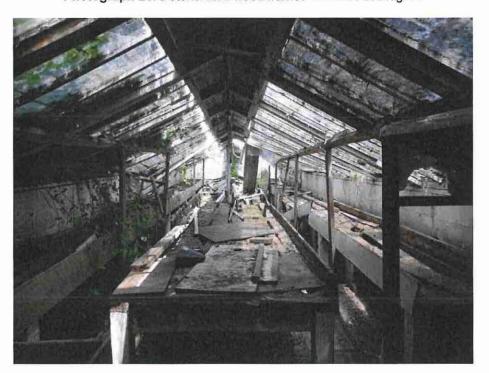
General view of the wood rafter and plank deck over Bldg. 2.
